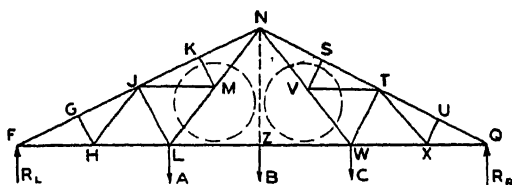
Skeleton Layout for Truss with Tank Loads.
